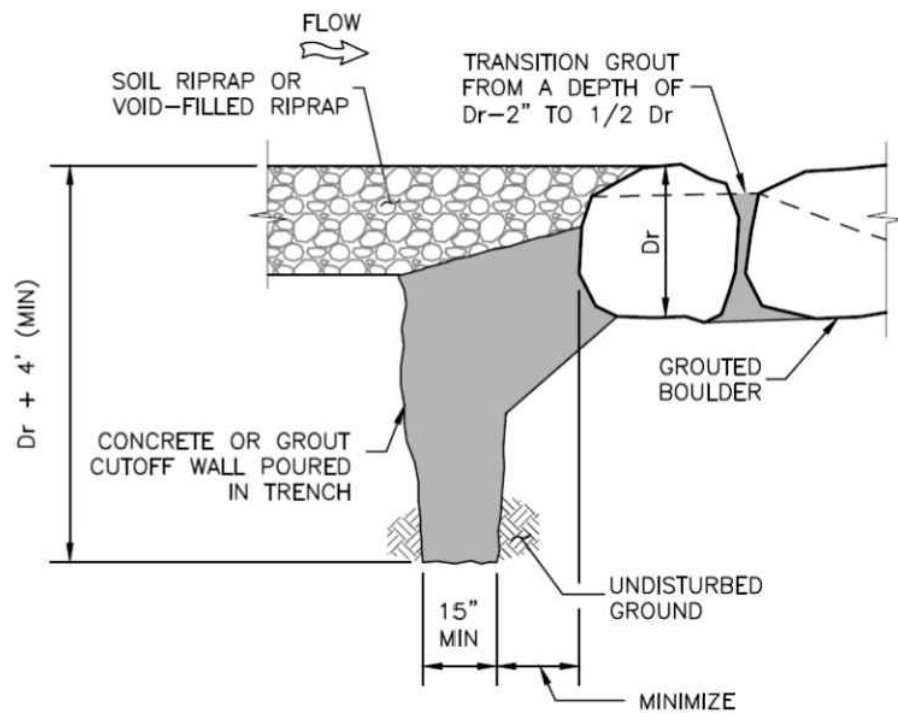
Concrete or grout cutoff wall upstream of drop structure
